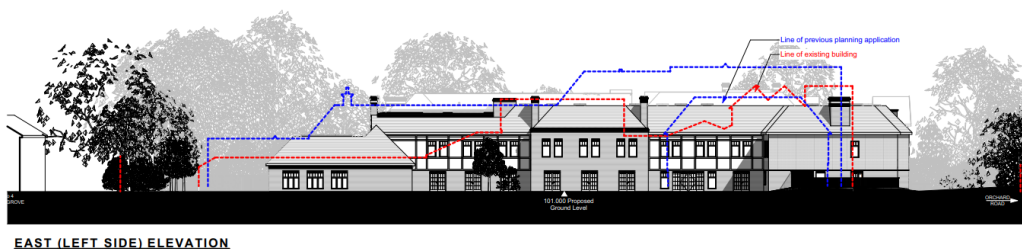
Proposed East elevation facing Baytree Close (red line indicate existing building. Blue line indicates previous dismissed scheme)
